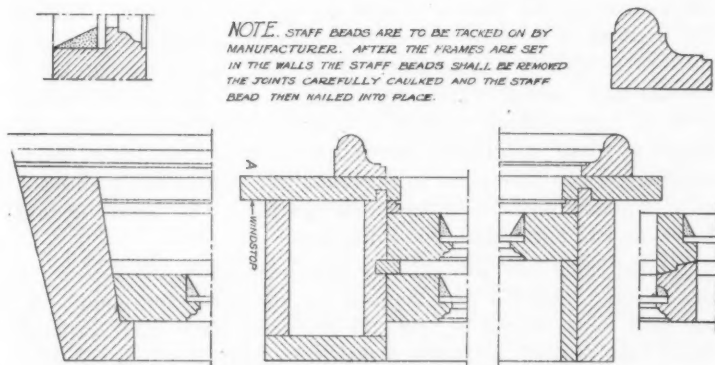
SPECIAL WINDOW BOX CONSTRUCTION TO PREVENT AIR LEAKAGE.
